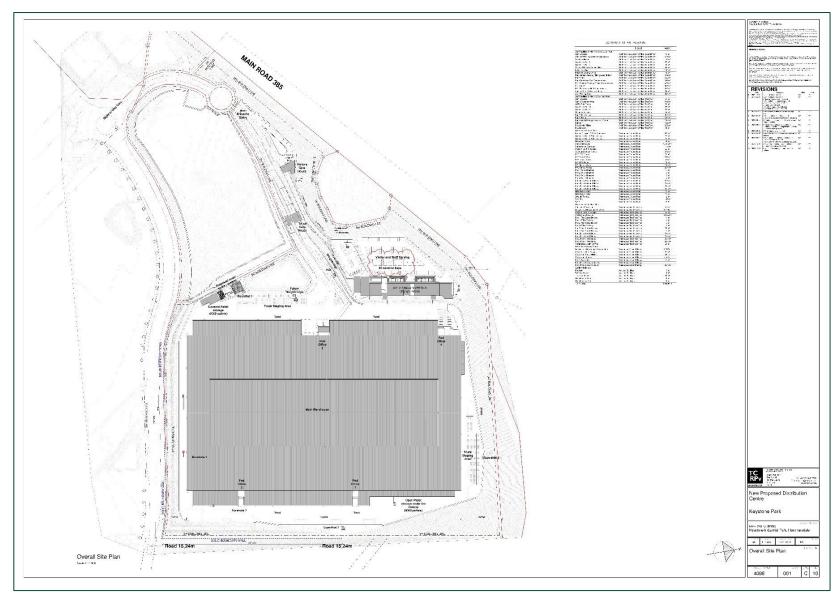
Overall site layout plan with layout of approved services (Source: TC RPv Architects).
